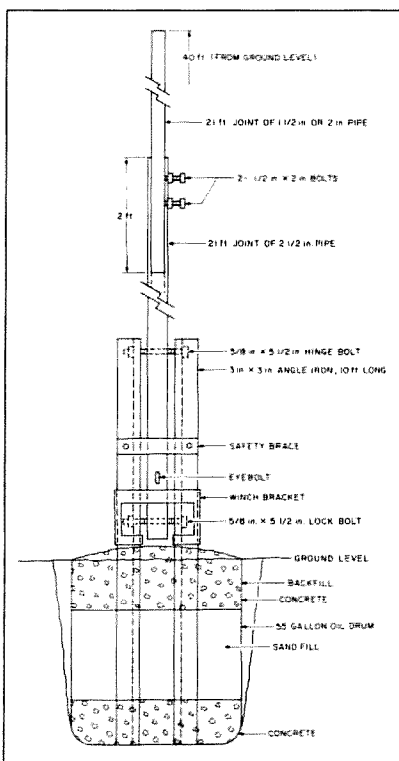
A. Mounting of tower base showing front view of mast-supporting angle brackets.
